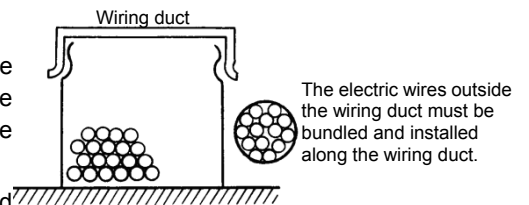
Installation of cables inside and outside of wiring duct
